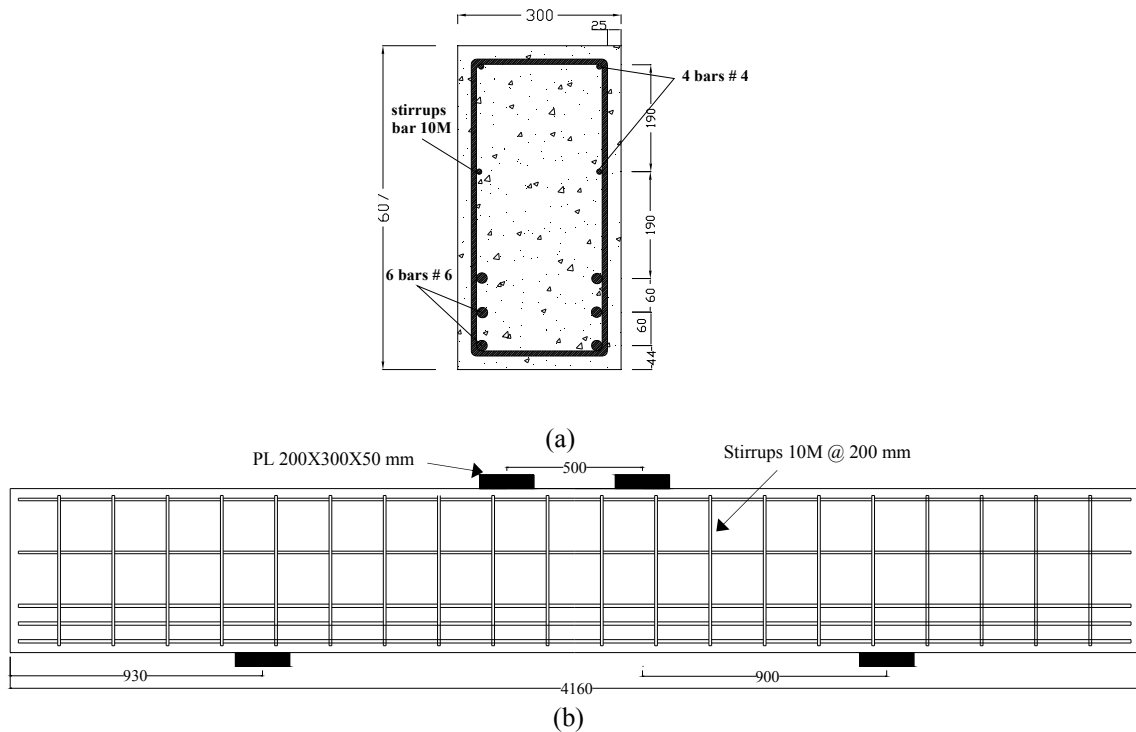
Beam MS2-2: (a) Cross section (b) Elevation
